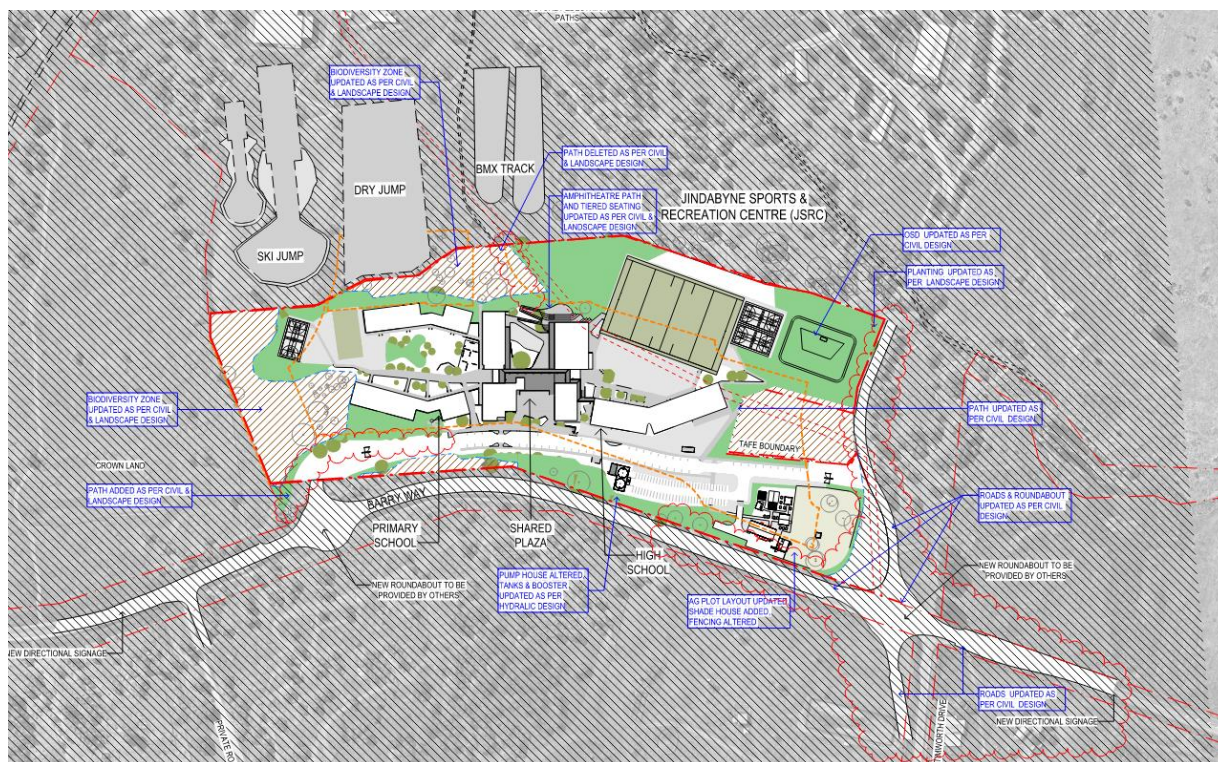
SUBMITTED SCHOOL SITE PLAN - SSD-15788005 MOD 2
